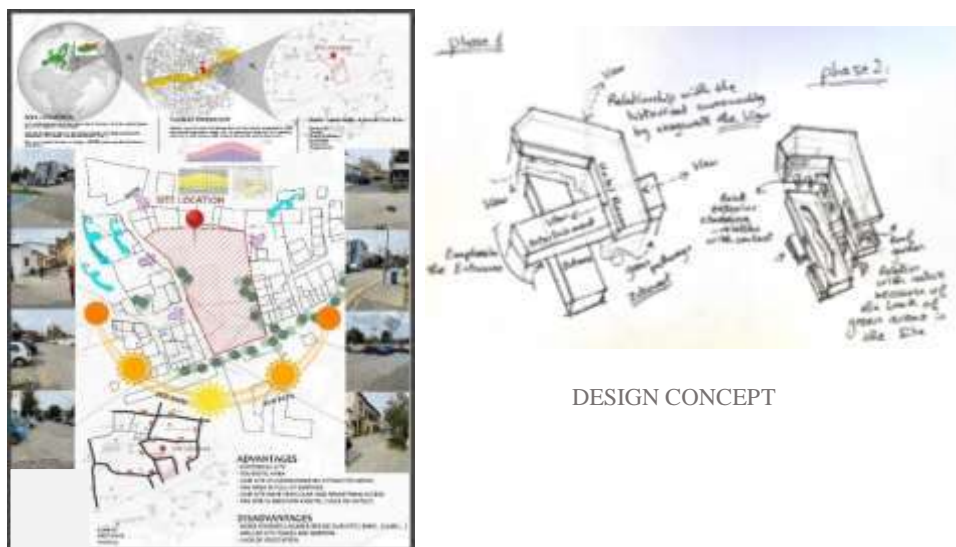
Site plan and three-dimensional drawing, Yara's project (edited by author, 2020)
